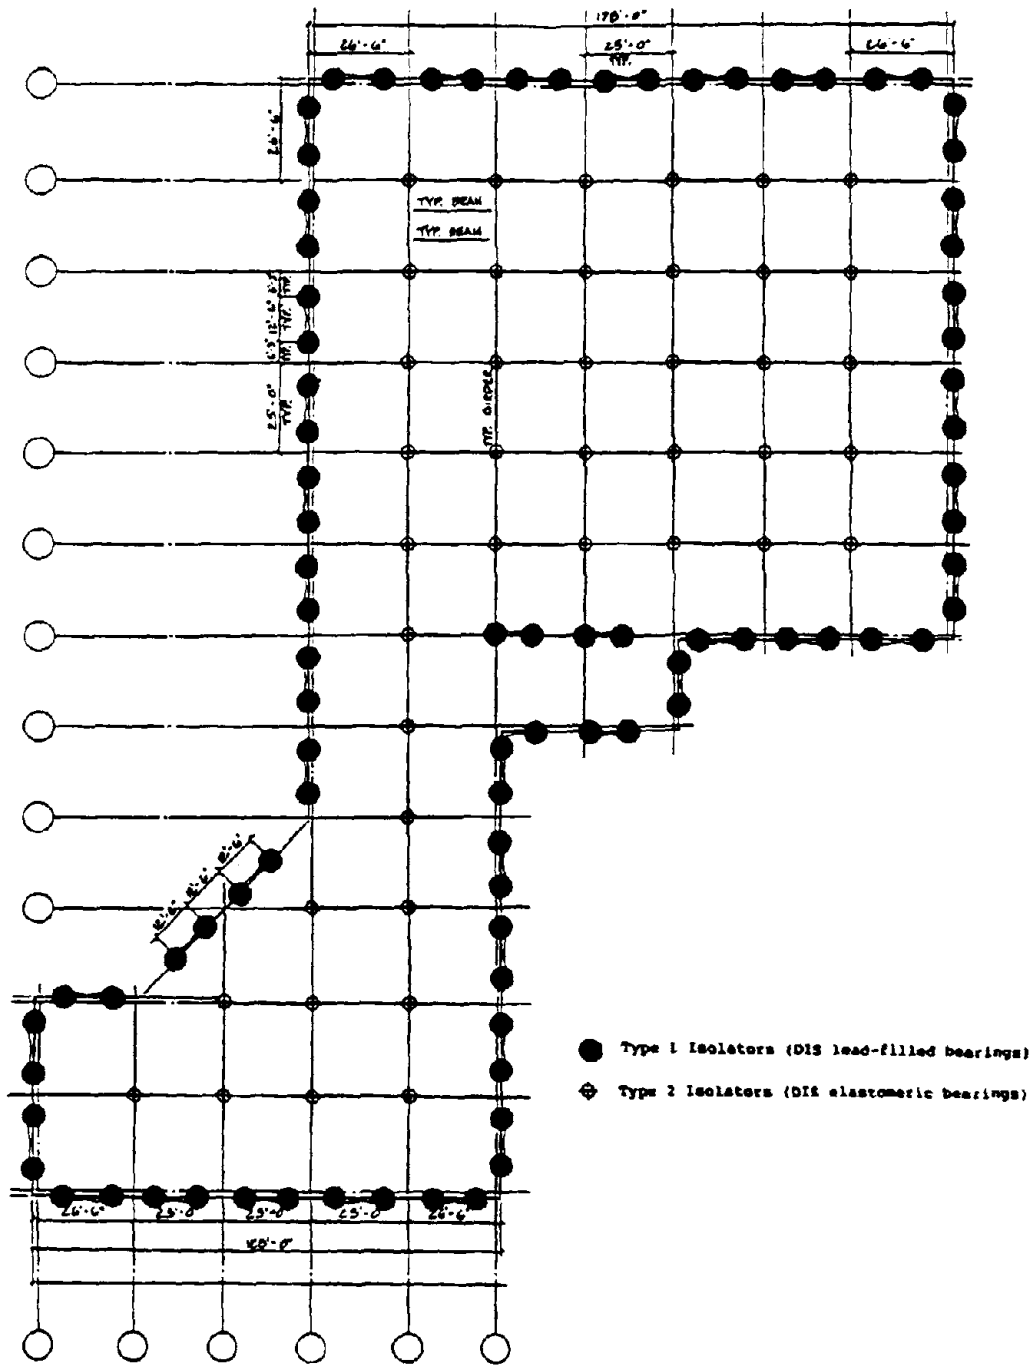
Plan of Isolator Layout in USC Teaching Hospital
